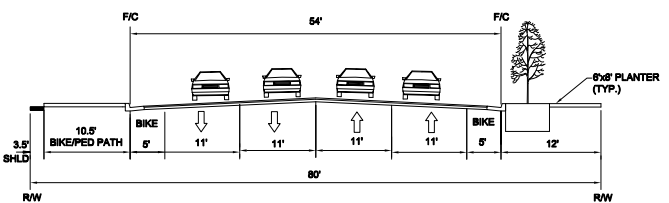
South Park Street Between Crocker St. and Stanford St. (looking east)
